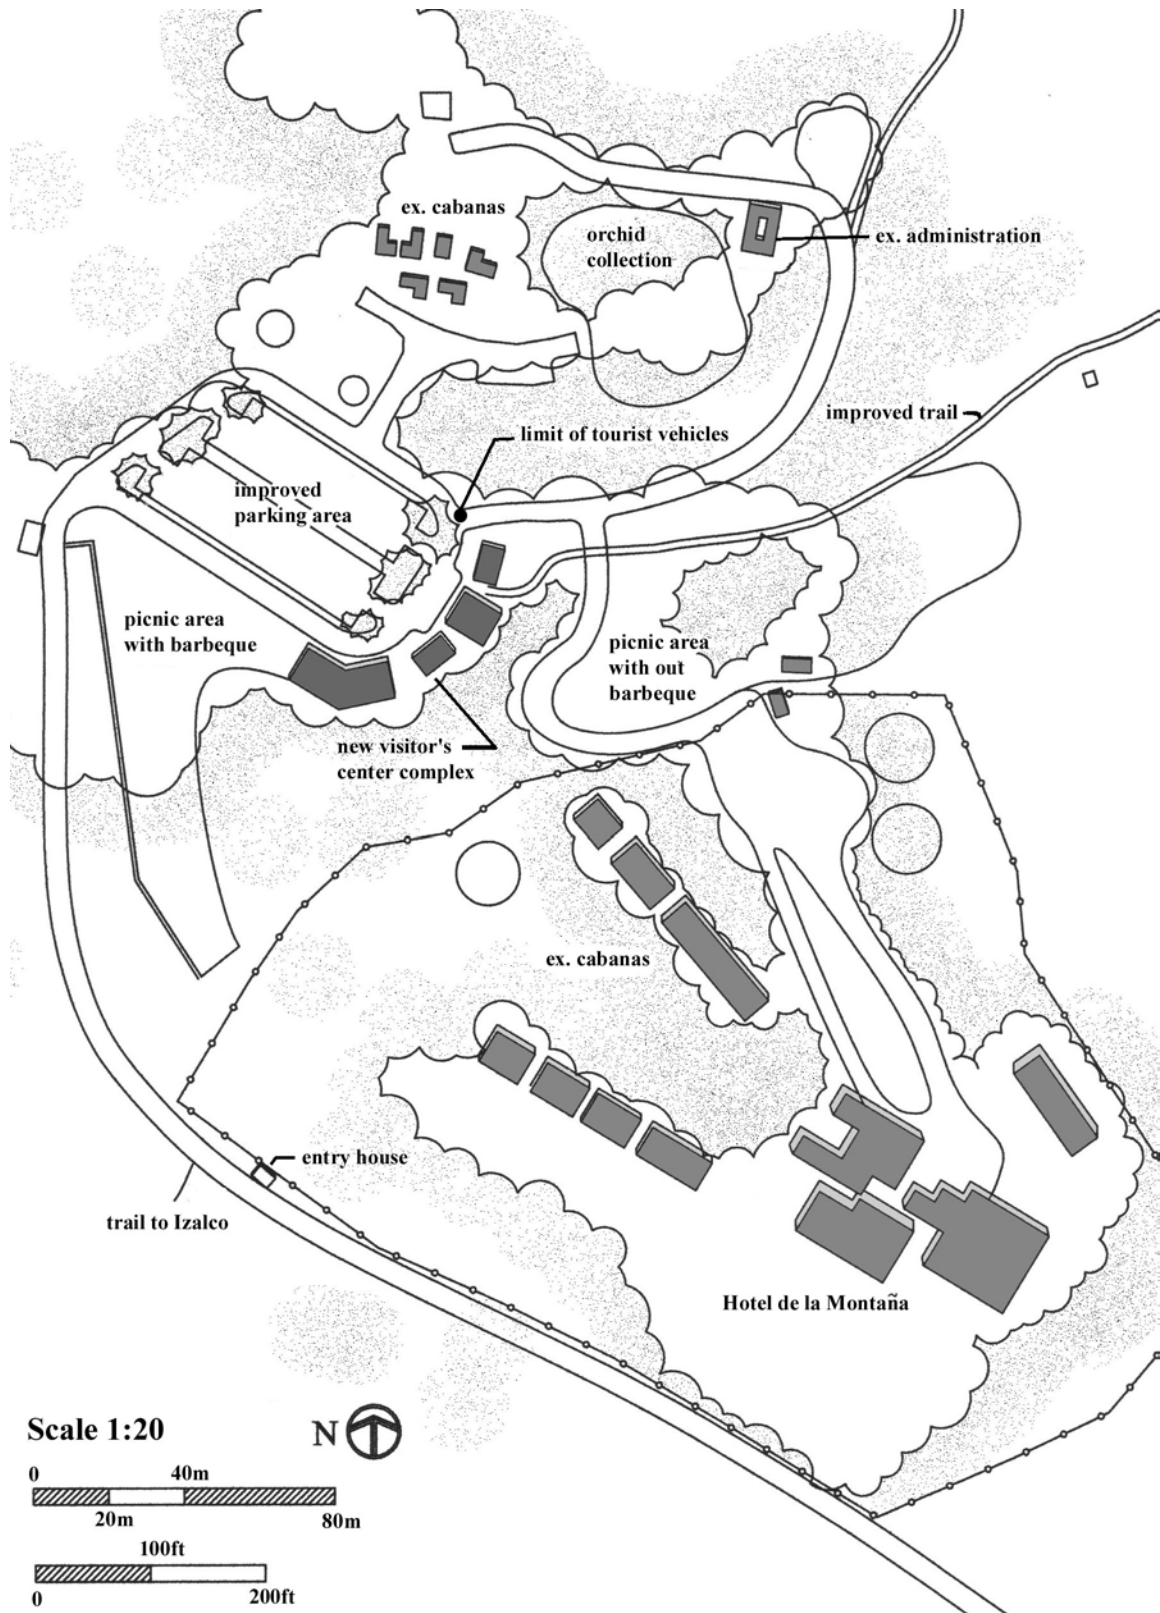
Conceptual Site Plan. Drawing by author.
